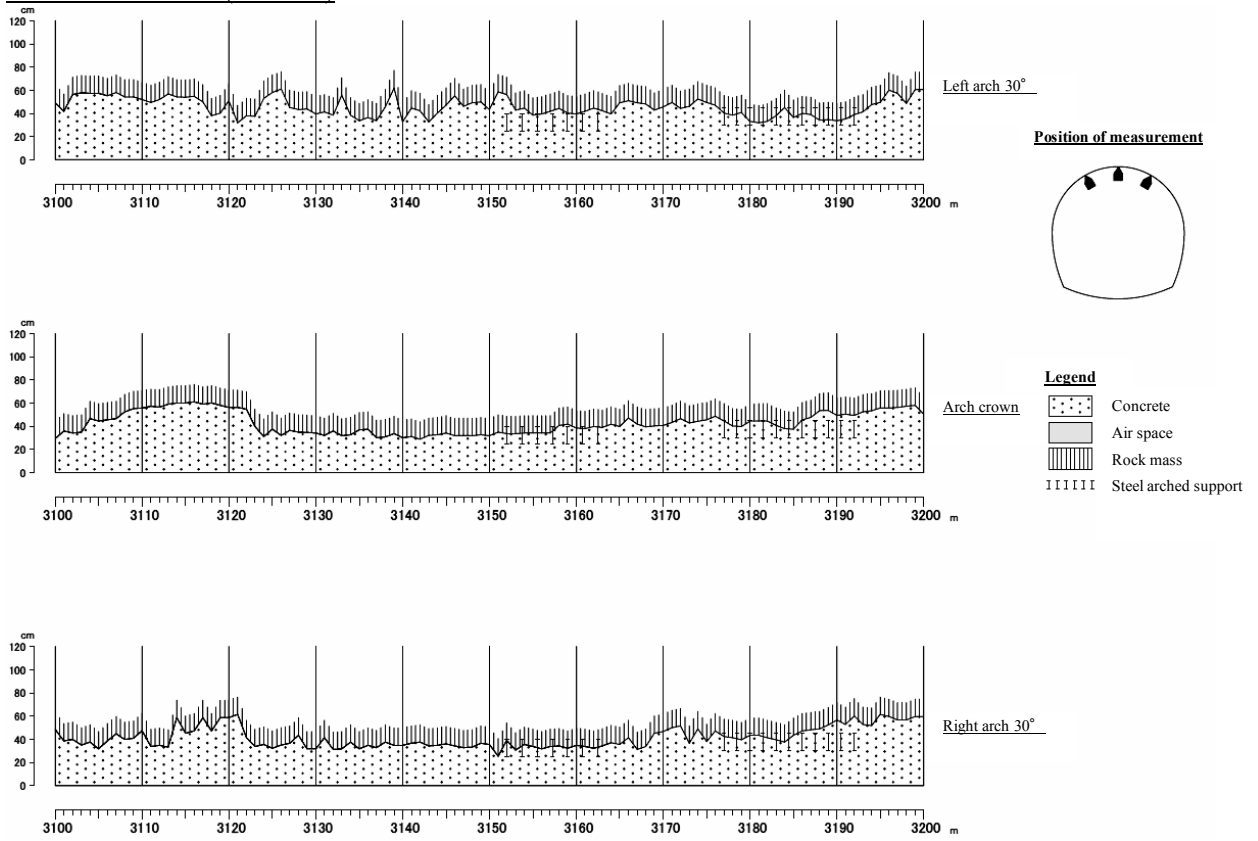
Investigation of Cavity behind Concrete in New Tunnel (2)
